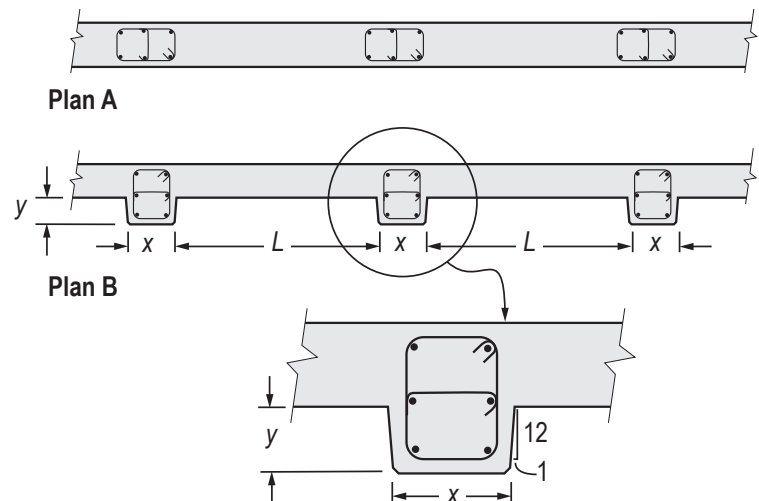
Pilasters increase the complexity of wall formwork, thus diminishing construction productivity. In the preferred alternative (Plan A), pilaster reinforcement is contained within a wall and the wall formwork has a planar surface. If pilasters must extend beyond one face of a wall (Plan B), the construction documents should provide a simple detail or note allowing the contractor to provide draft. (Image courtesy of Ceco Concrete Construction.) Another constructable pilaster design alternative is increasing the pilaster reinforcing tie size and spacing to allow shotcrete to be used. Refer to Fig. 2.12.10. (Image courtesy of Conco.)
